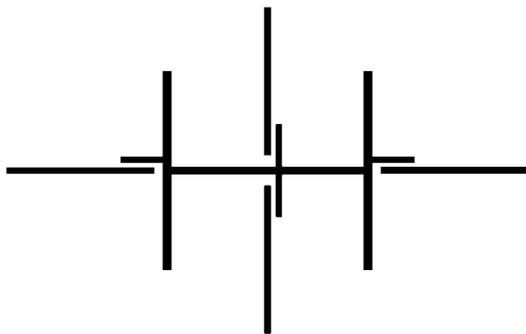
Column erection drawing to ensure placement of beams on the correct side of the welded single-plate connections.
